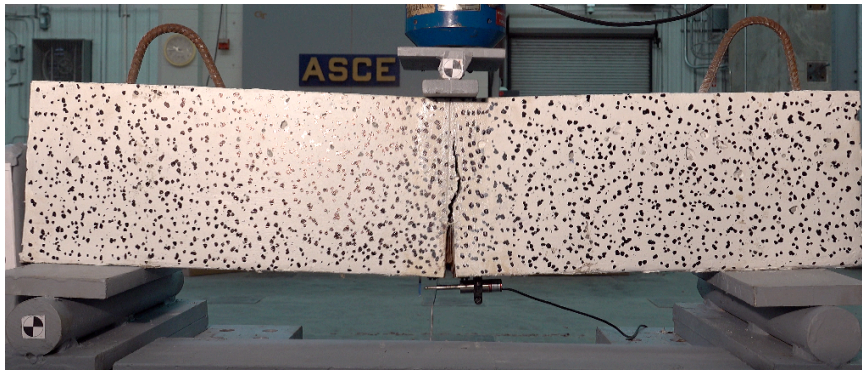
Four-foot epoxy-repaired unreinforced concrete beam behavior.
